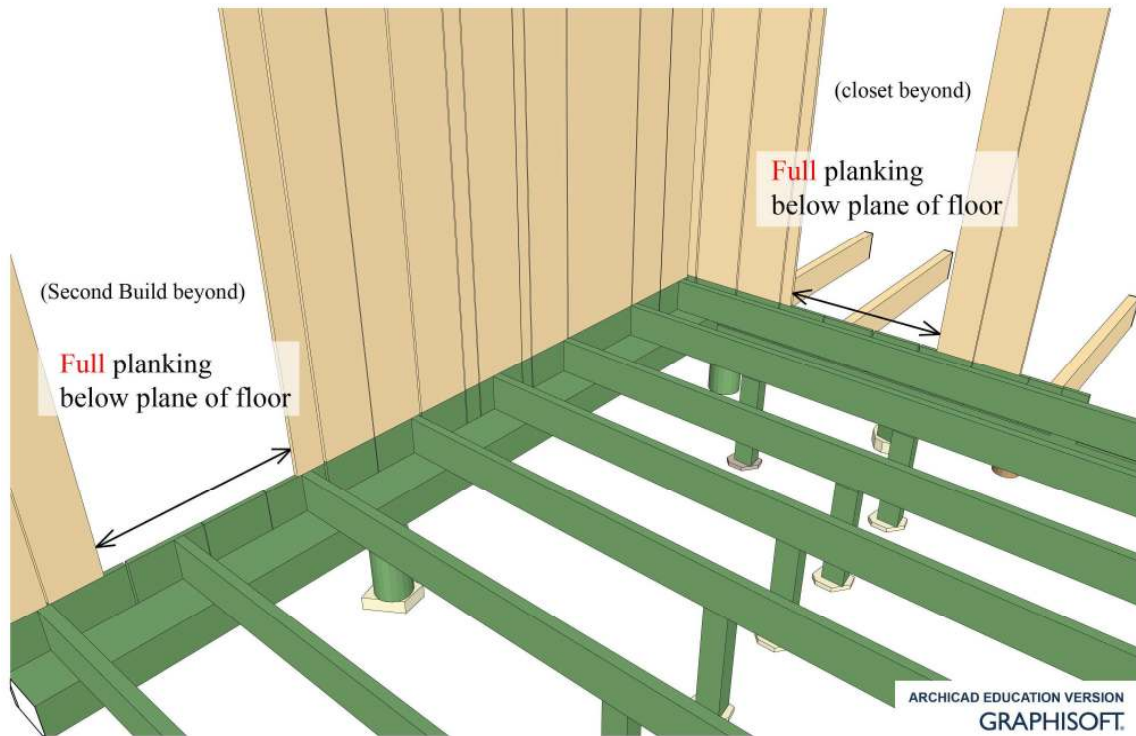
Planking at doorways into First Build Wing and original entrance.
